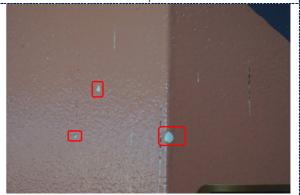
Work 9 – Detail below – 3×100 x losses with multiple surface accretions.
